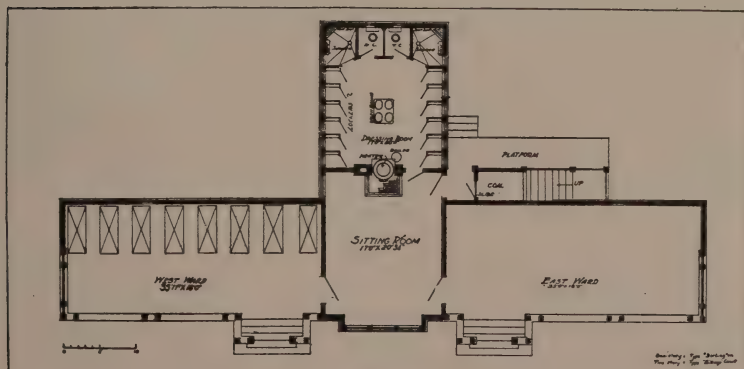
TWO-STORY SHACK, ON MODIFIED PLAN OF KING LEAN-TO, OTISVILLE.
